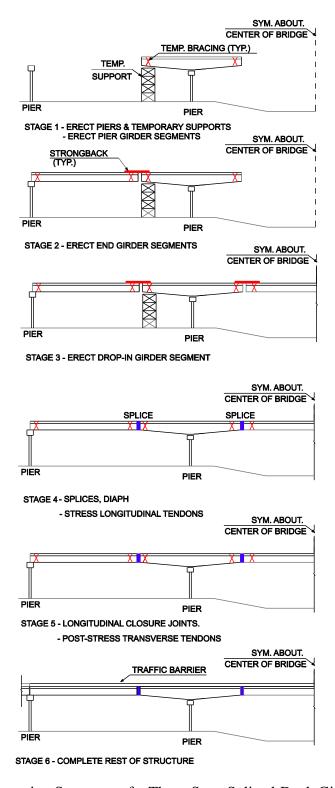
Construction Sequence of a Three-Span Spliced-Deck Girder Bridge
